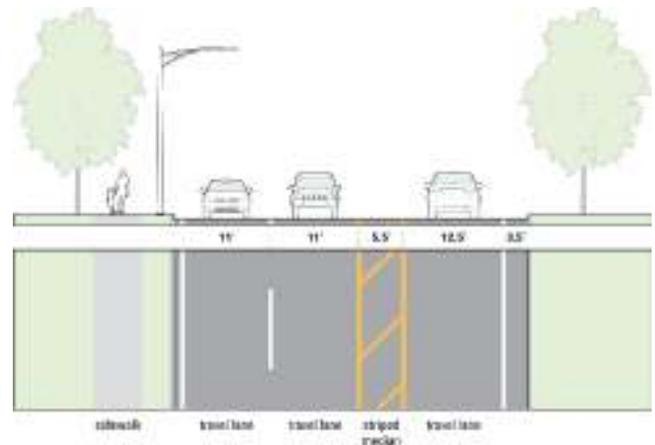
Hammond Pond Parkway Segment 1B Existing Typical Cross Section
